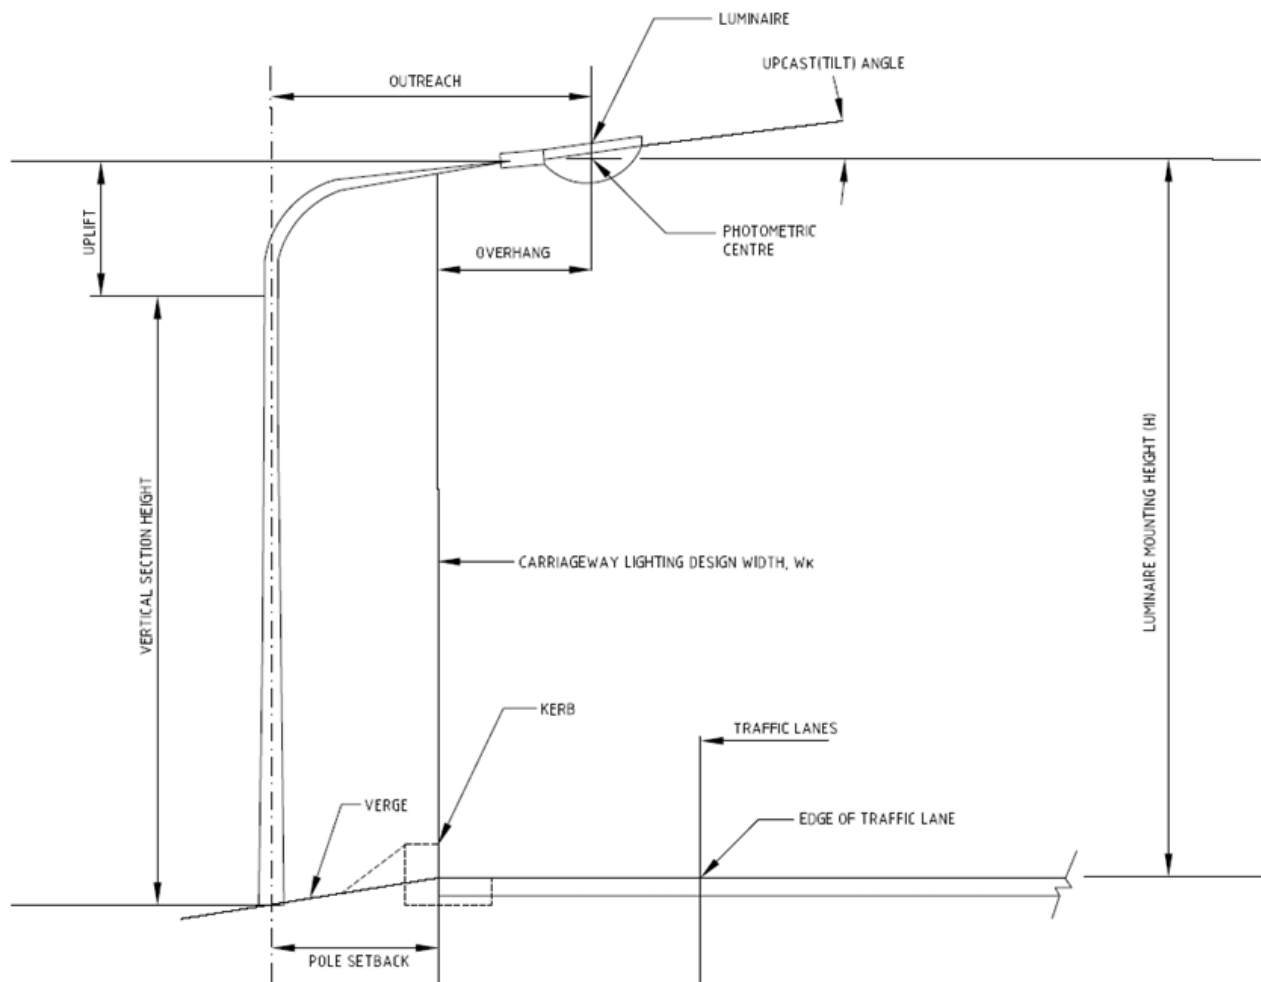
Geometry and Terminology used in a Typical Road Lighting Installation
